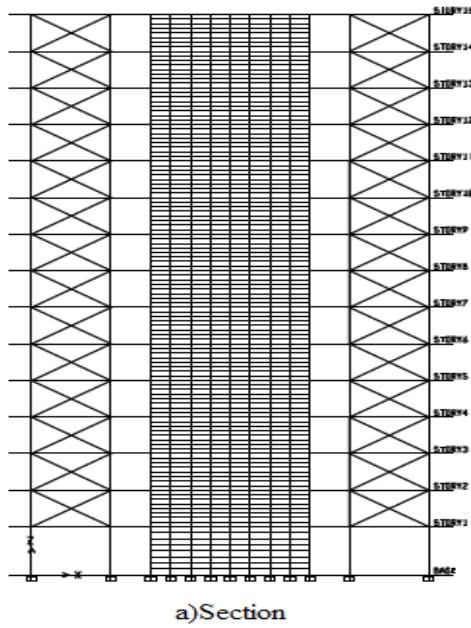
Model-7 OGS Frame with Shear wall at Sides (Central peripheral 1 ½ span provided with shear wall)
